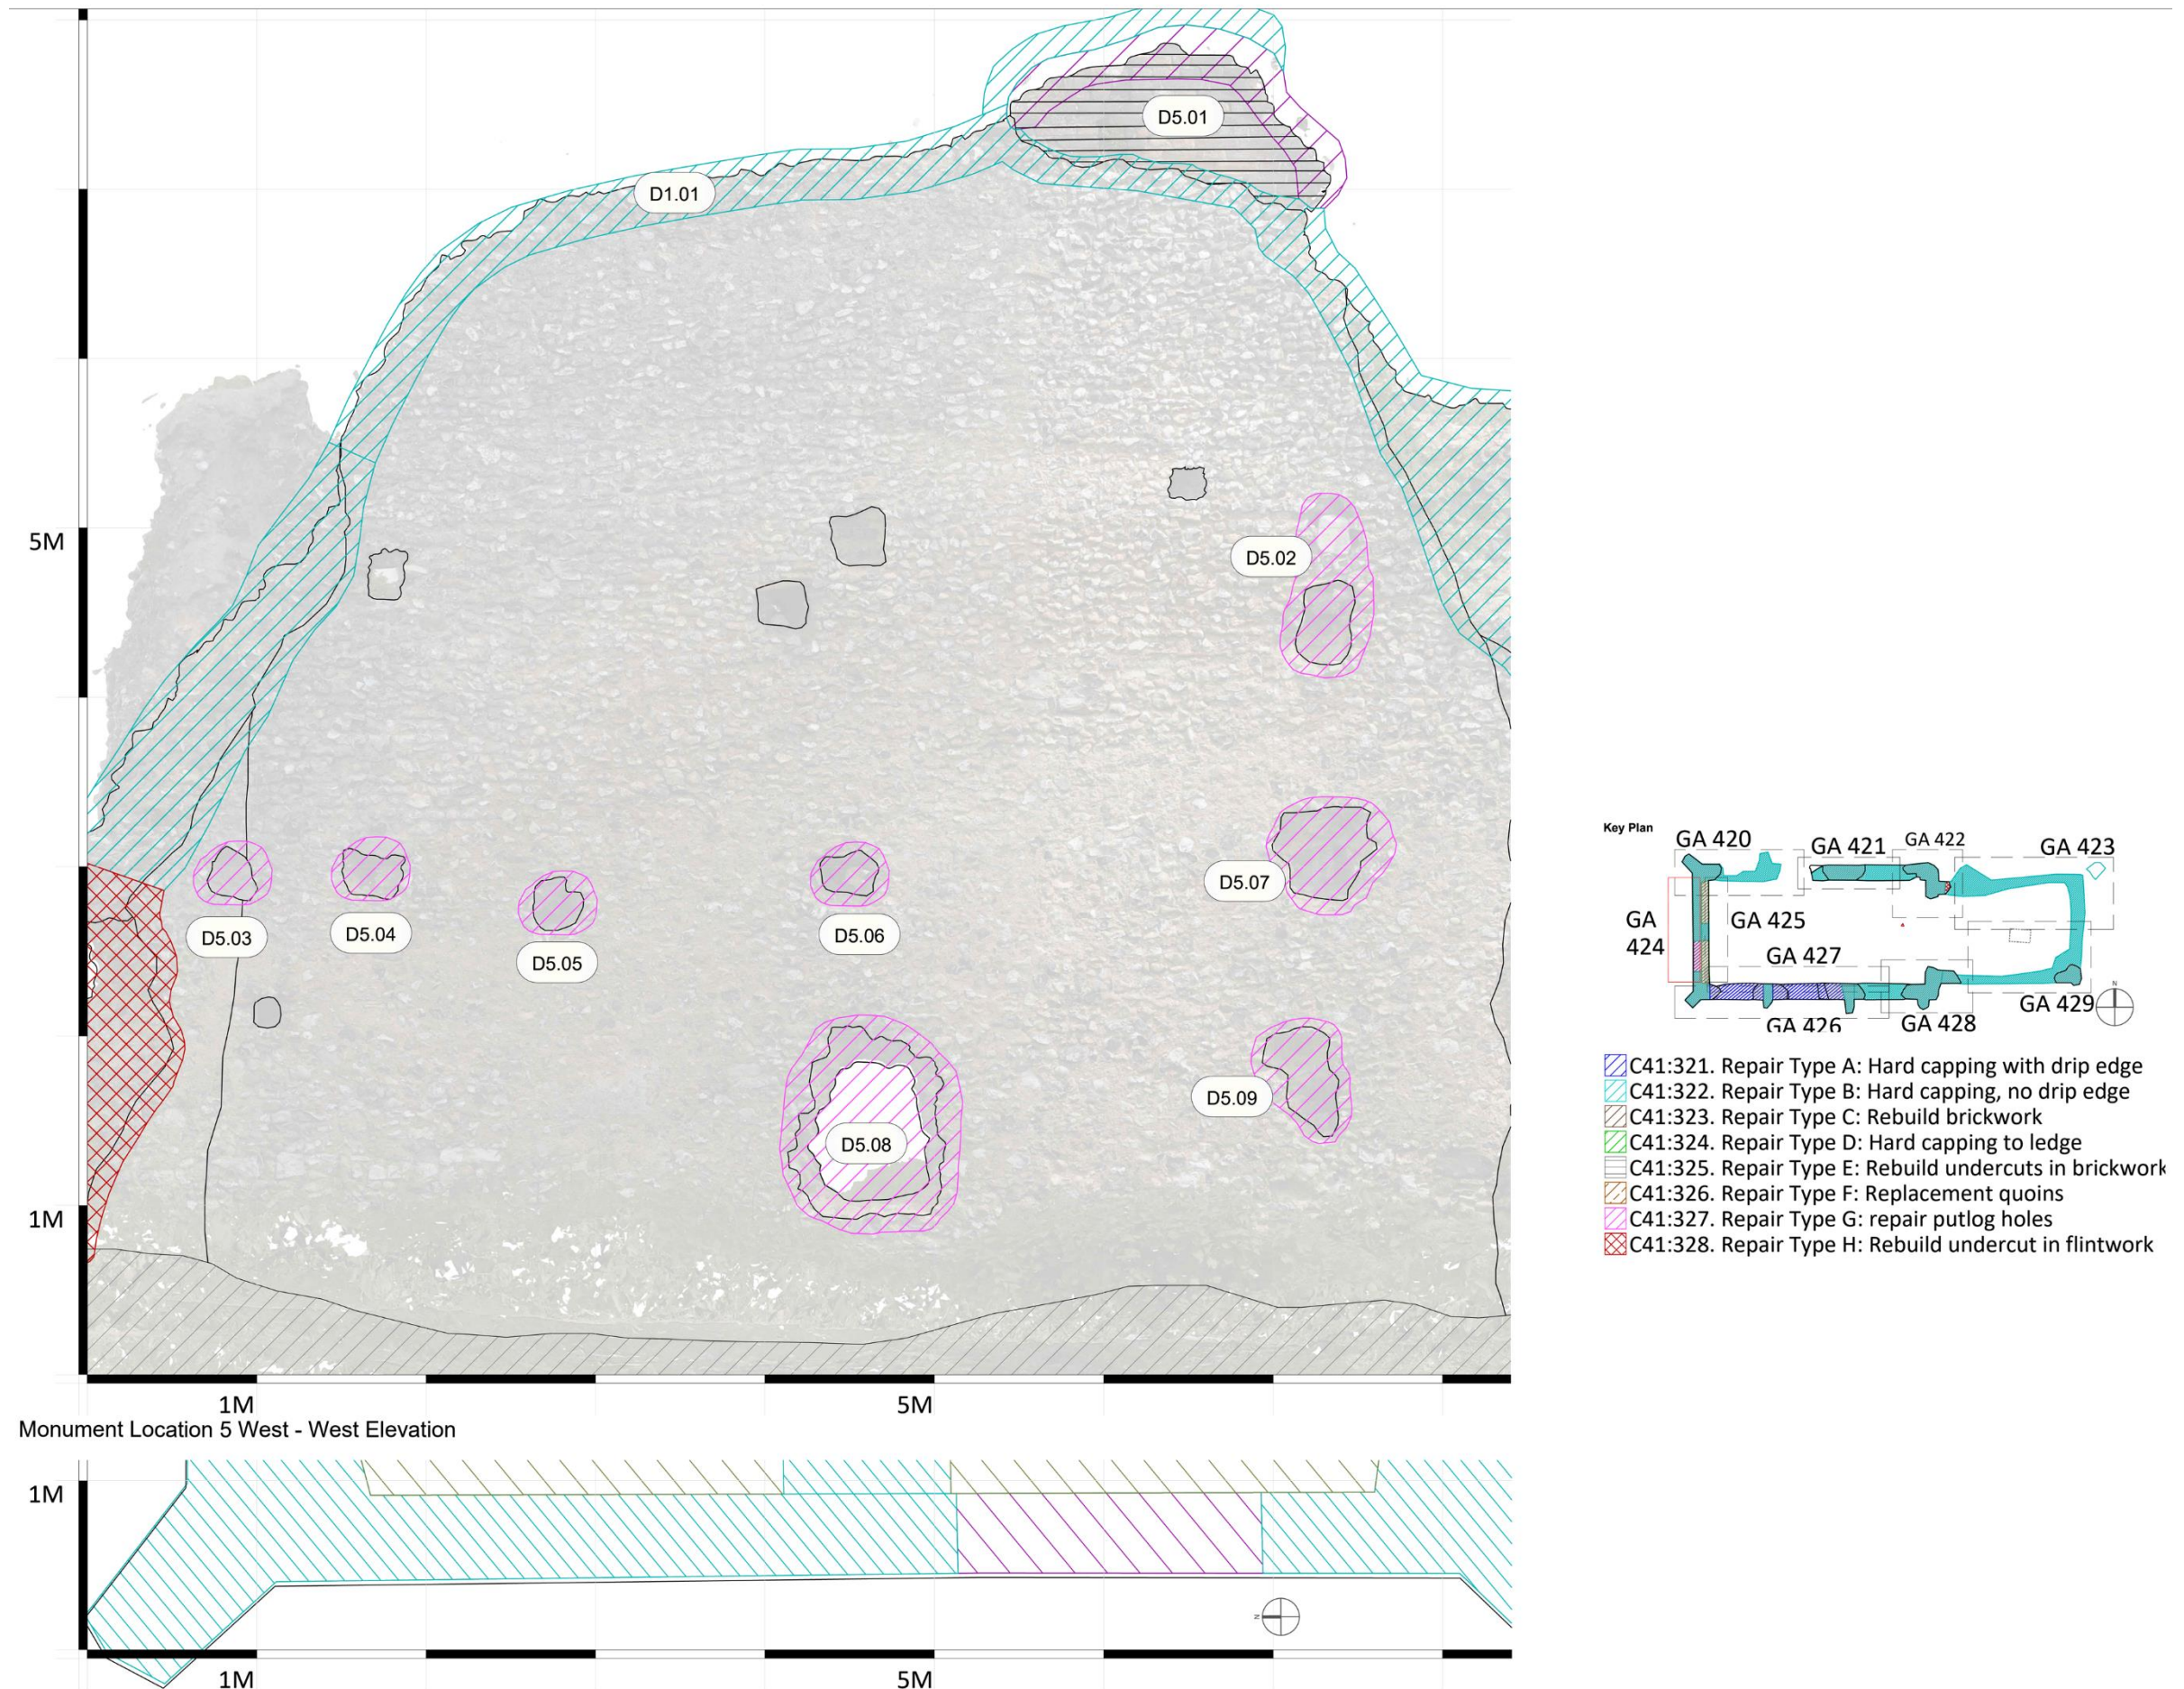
Works undertaken to the west elevation of the west wall (scale 1:40)
